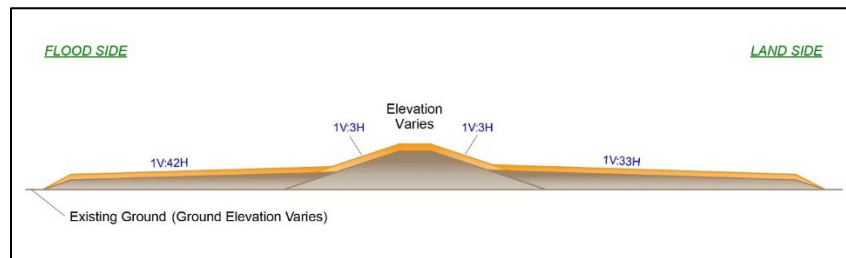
Typical Cross-section with Berms for First and Second Lifts for West Slidell
